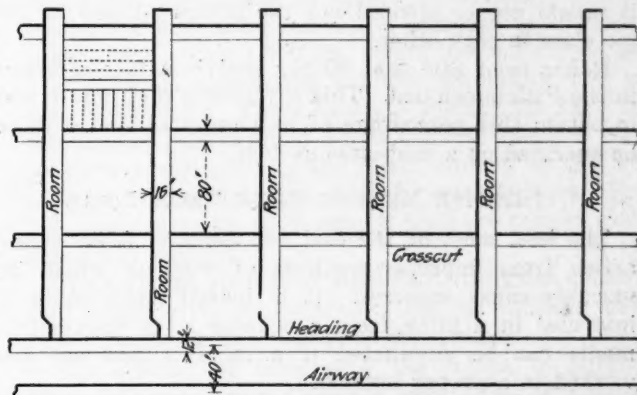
RELATION OF PILLARS AND ROOMS AND A METHOD OF ROBBING ROOMS
